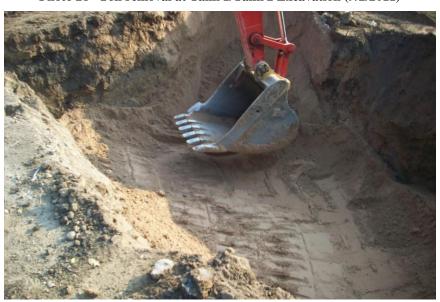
Backfilling at Tank 1/Tank 2 Excavation (9/2/2011)
